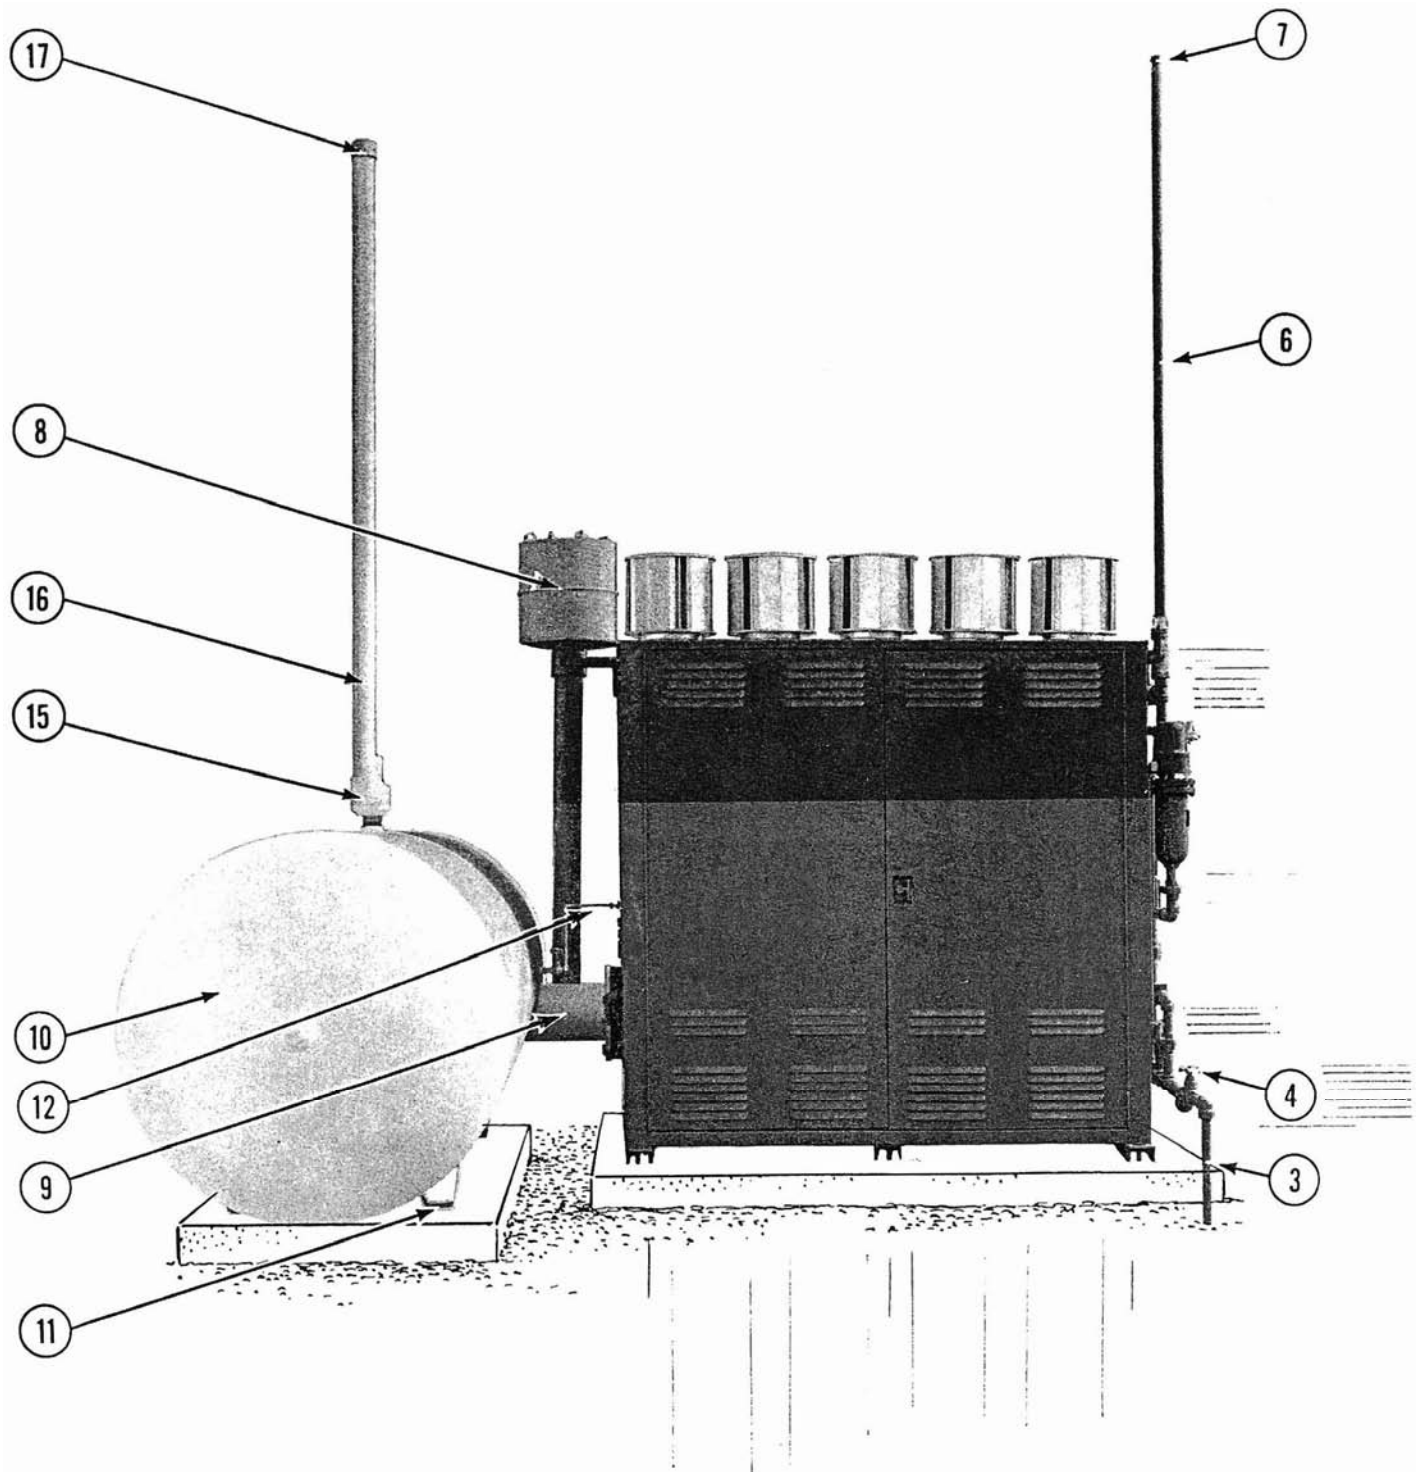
PAMW 900-50 Installation Typical for -10 to -50
